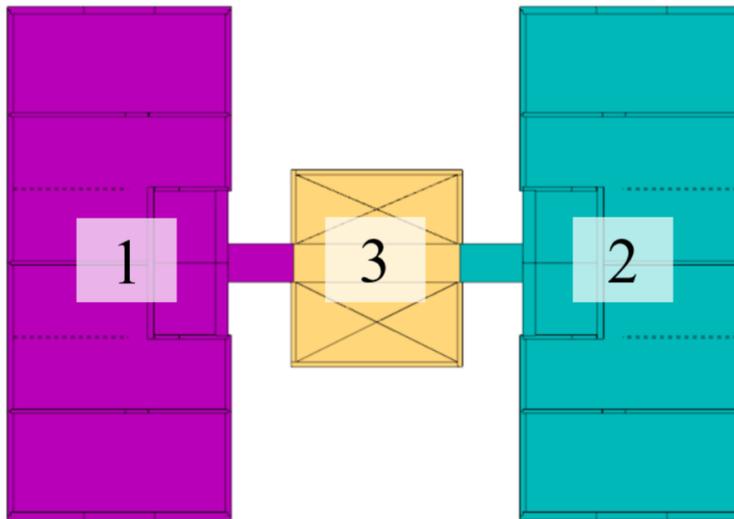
The tower blocks can be considered as three separate buildings; the residential blocks together with the link bridges and the lift/stair core alone
